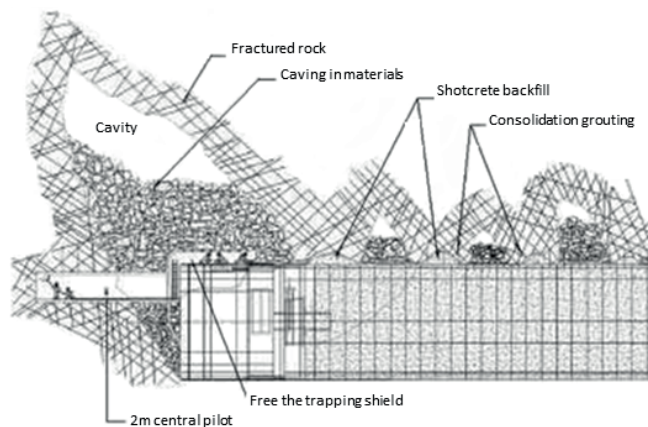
Example of instability problem at the tunnel face of the Pinglin Highway tunnel, Taiwan, after Barla and Pelizza (2000).
